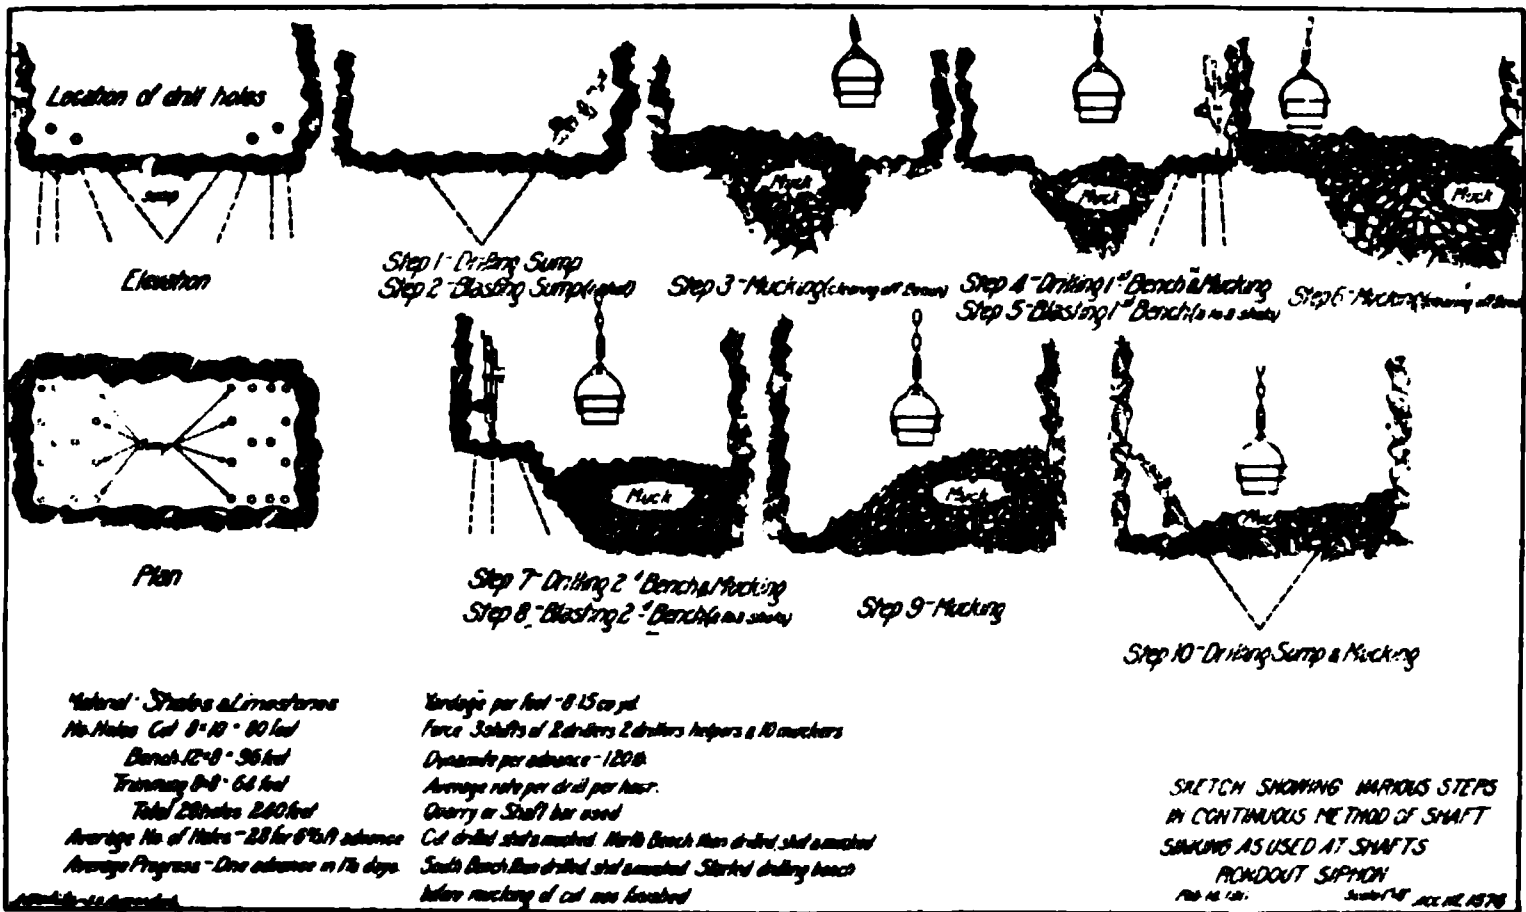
METHOD OF SINKING RECTANGULAR SHAFTS, RONDOUT SIPHON.
